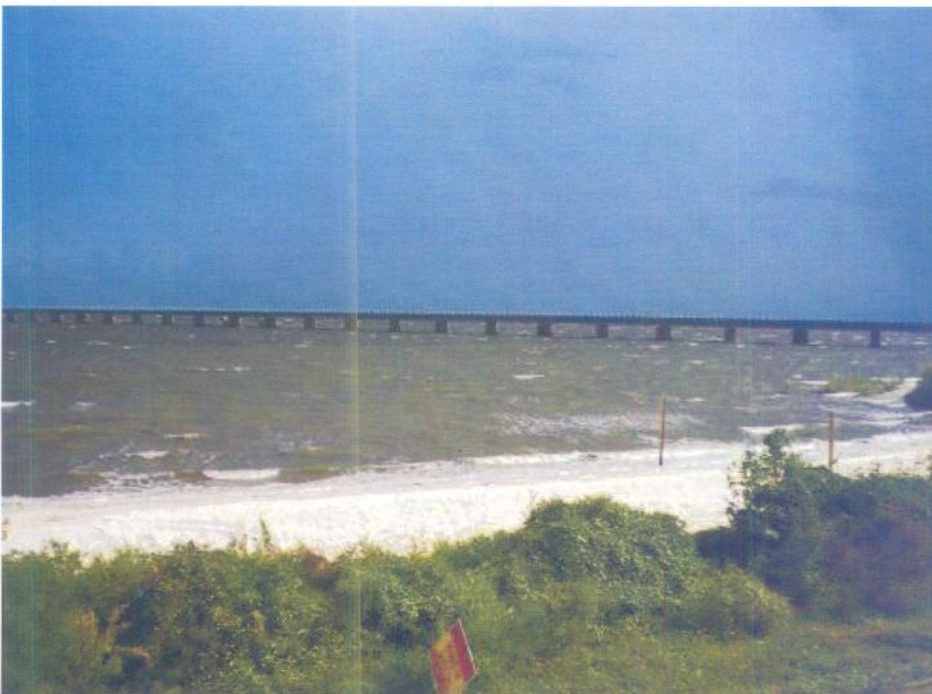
Overview of Municipal Harbor Site. Northwest facing southeast.
